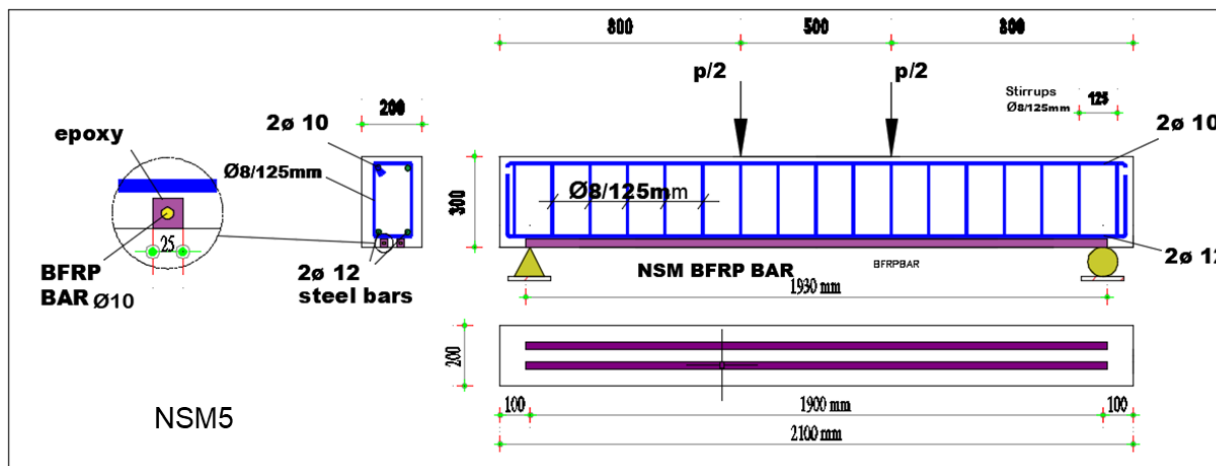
Details of beam NSM5 as illustrated by bottom and cross-sectional views of the concrete beams.
